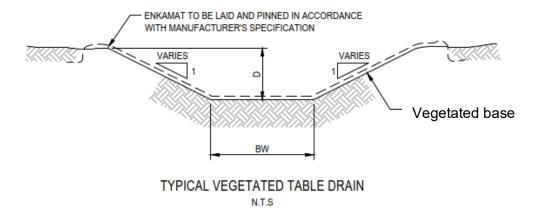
Cross-section batter drain proposed within centre of G-loop configuration
